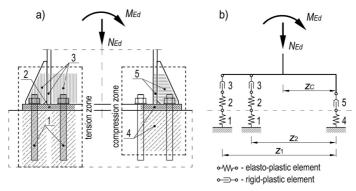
Reinforced column base: a) basic components of the column base, b) mechanical model of the column base – model I. 1 – anchors fixed in the concrete in the tension zone, 2 – base plate in the tension zone, 3 – stiffener, column flange and column web in the tension zone, 4 – base plate and concrete foundation in the compression zone, 5 – stiffener and column flange in the compression zone
